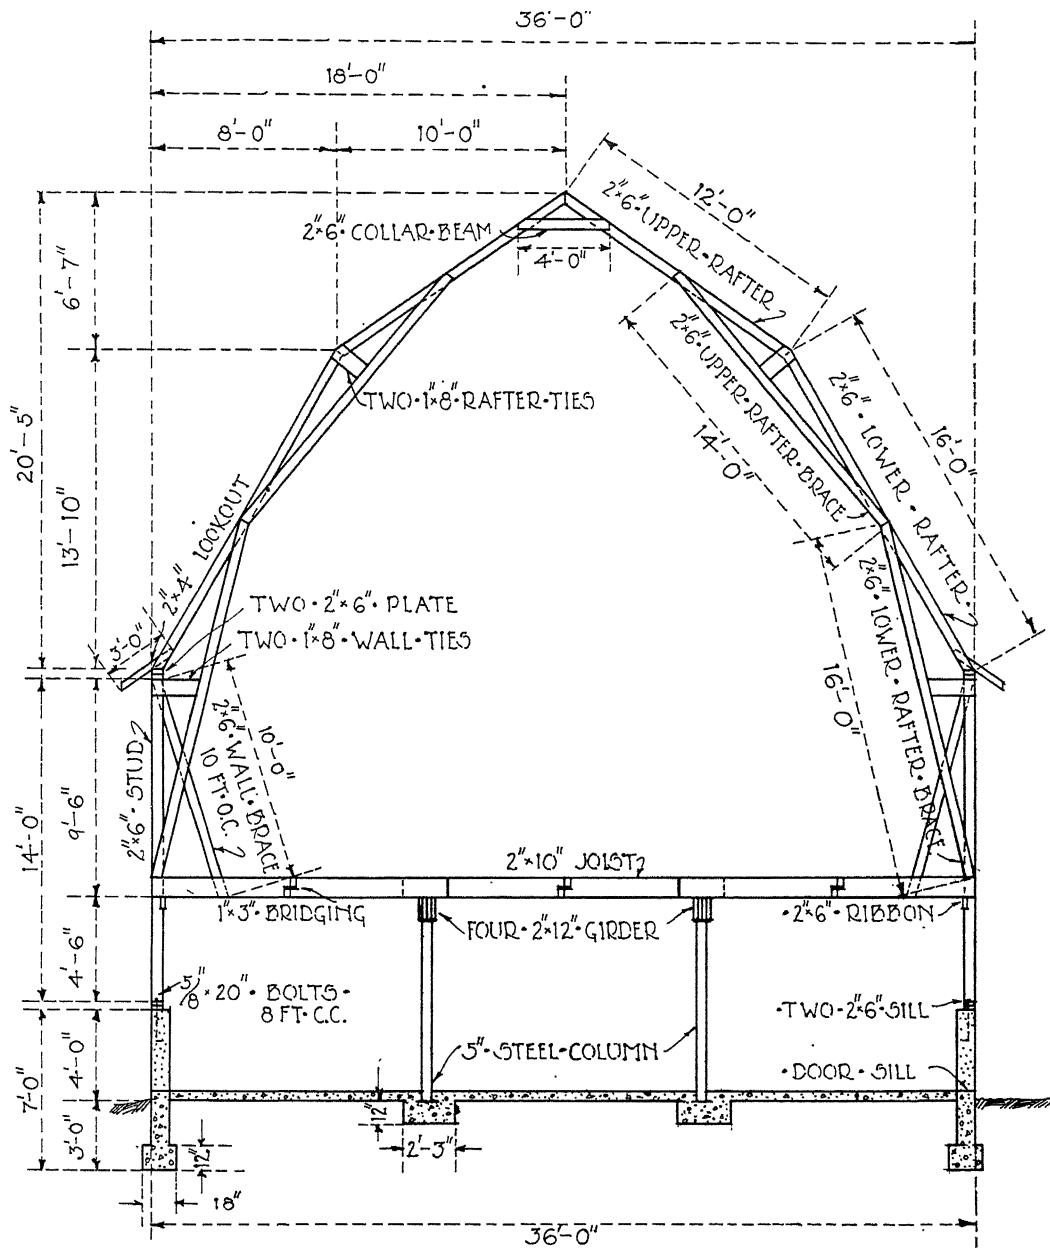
Cross section of a 36-foot braced rafter barn. Only framing details are shown. All rafters, rafter braces, ties, lookouts, studs, and joists, are spaced 24 inches on center. Wall braces are 10 feet on center. Lookouts same slope as upper rafter. (For wall and rafter tie details see Figs. 5 and 6. Girders shown in detail in Figs. 13 and 14). Lengths of joists and spacing of columns and girders not shown. These dimensions will vary according to the floor plan. Note that spacing of girders controls width of hay door opening (see Figs. 10 and 11).
